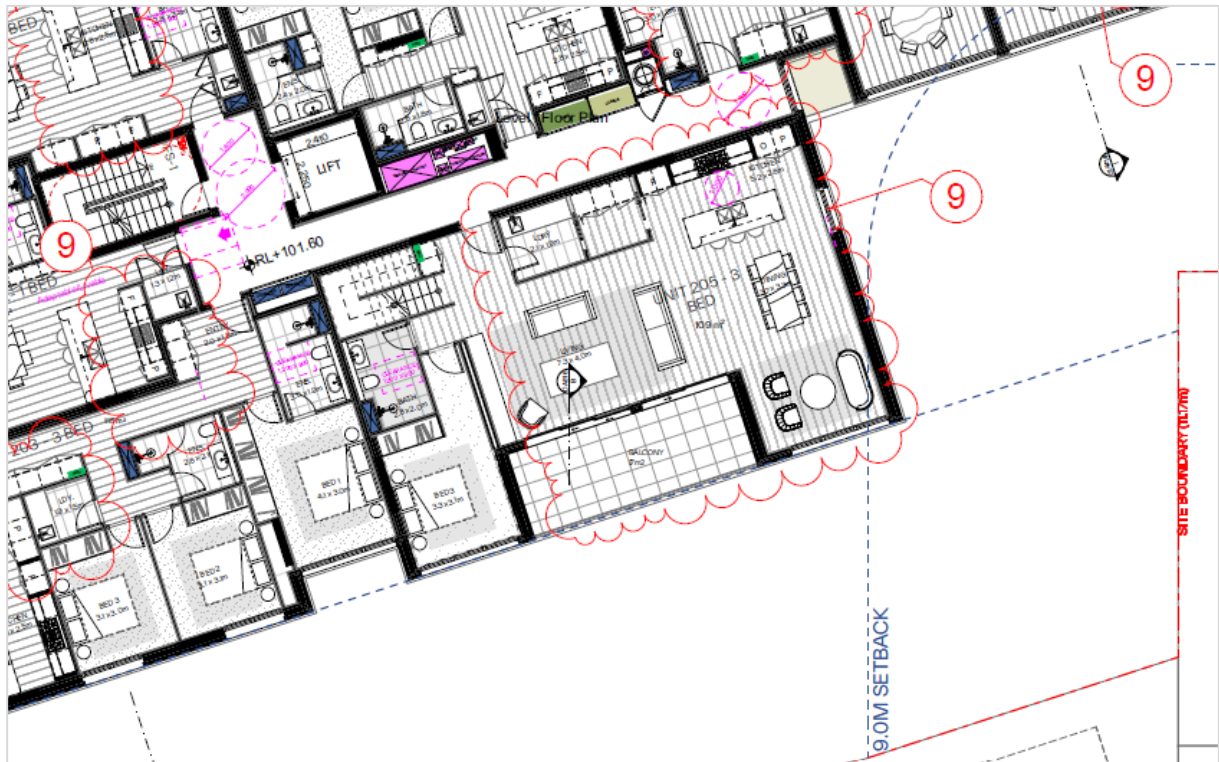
s4.55(2) Modified Plan - Level 2 Floor Plan (Unit 205)
